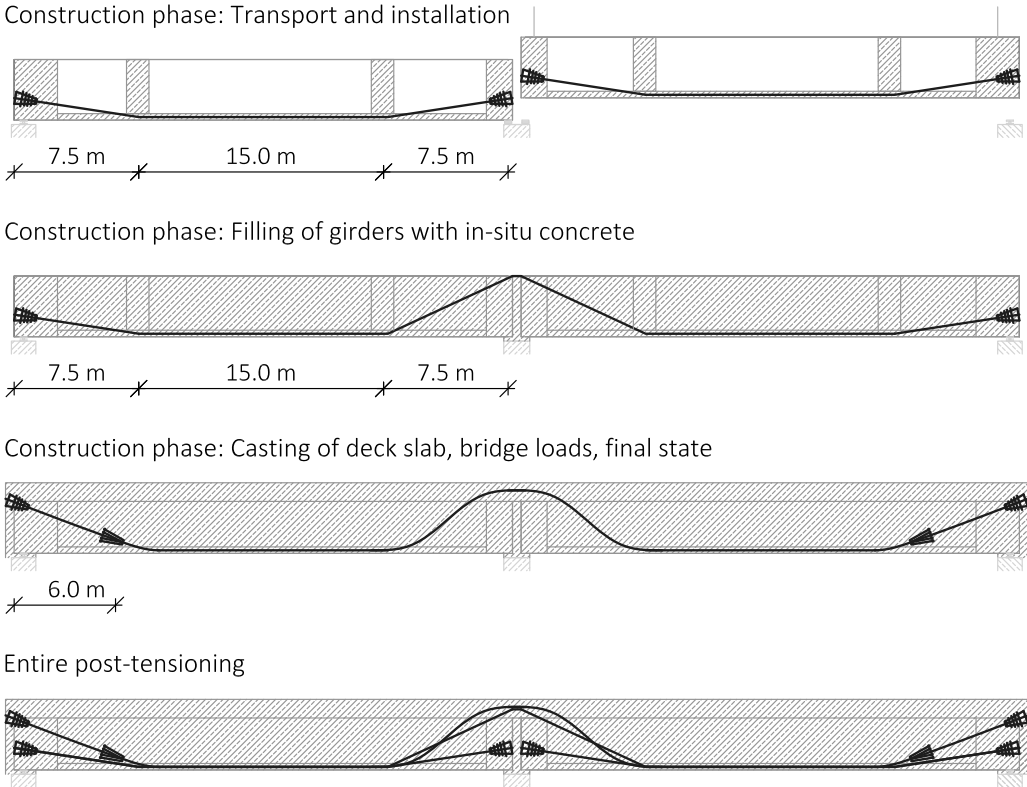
Tendon elevation in each construction phase of the redesigned L21 Overpass
